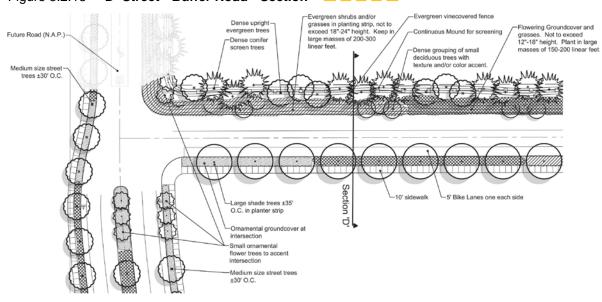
'D' Street - Buffer Road - Plan
